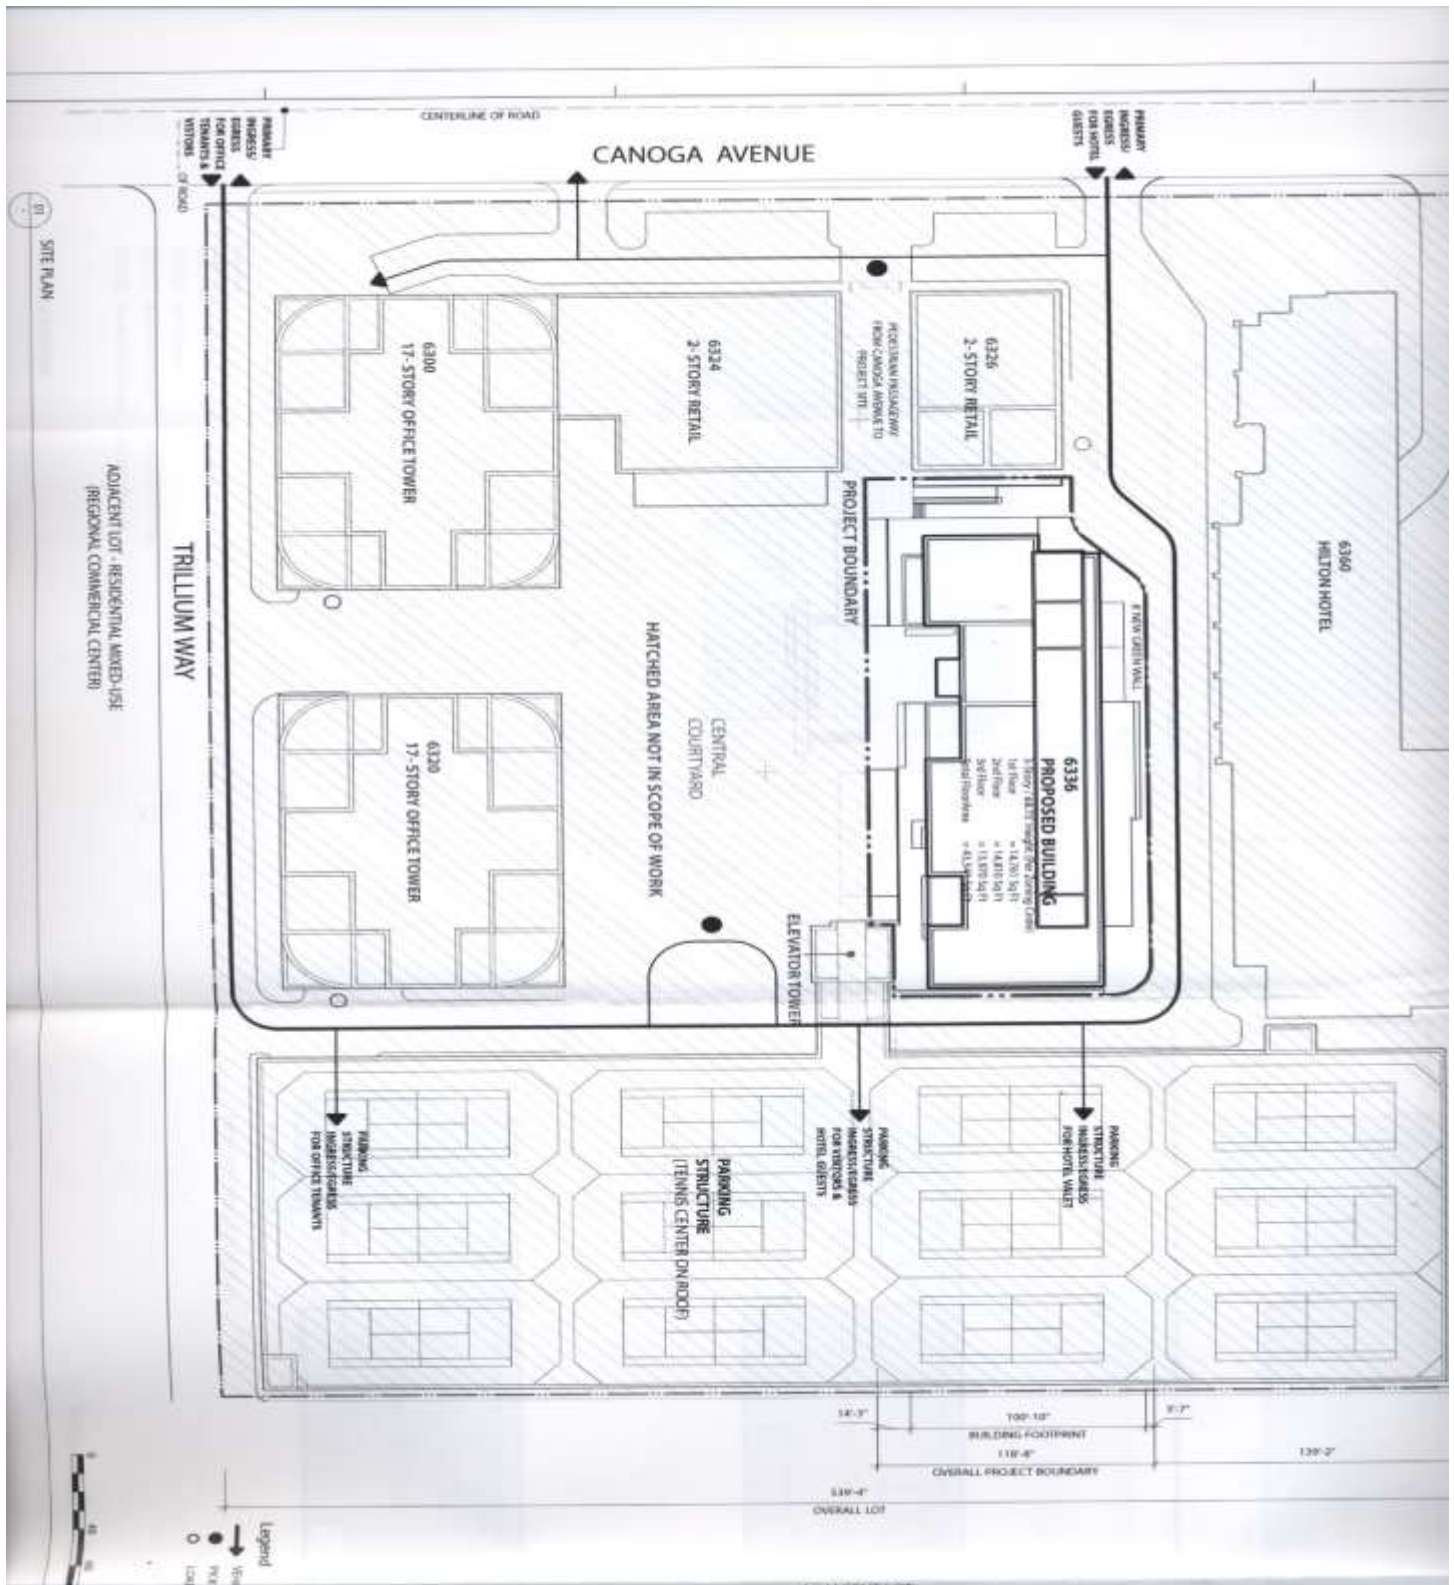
Trillium Commercial Center Showing Proposed Three-Story New Office Building
